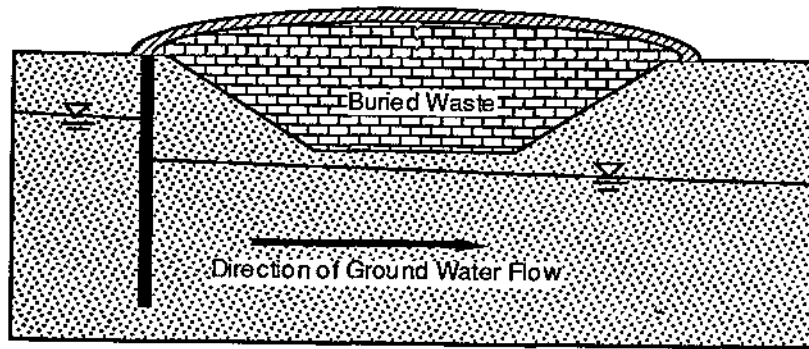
Example of Vertical Cutoff Wall to Limit Flow of Ground Water through Buried Waste.
